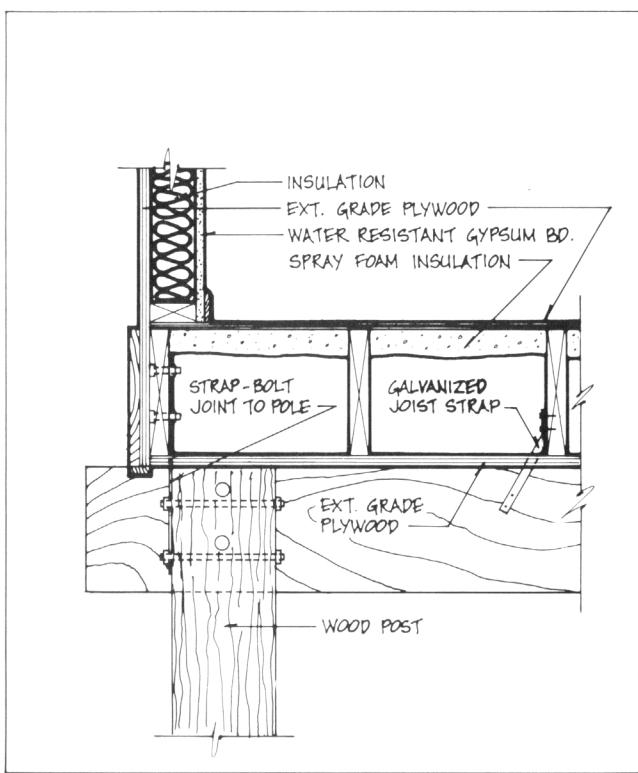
Insulated Floor Section, Wood Post Foundation
